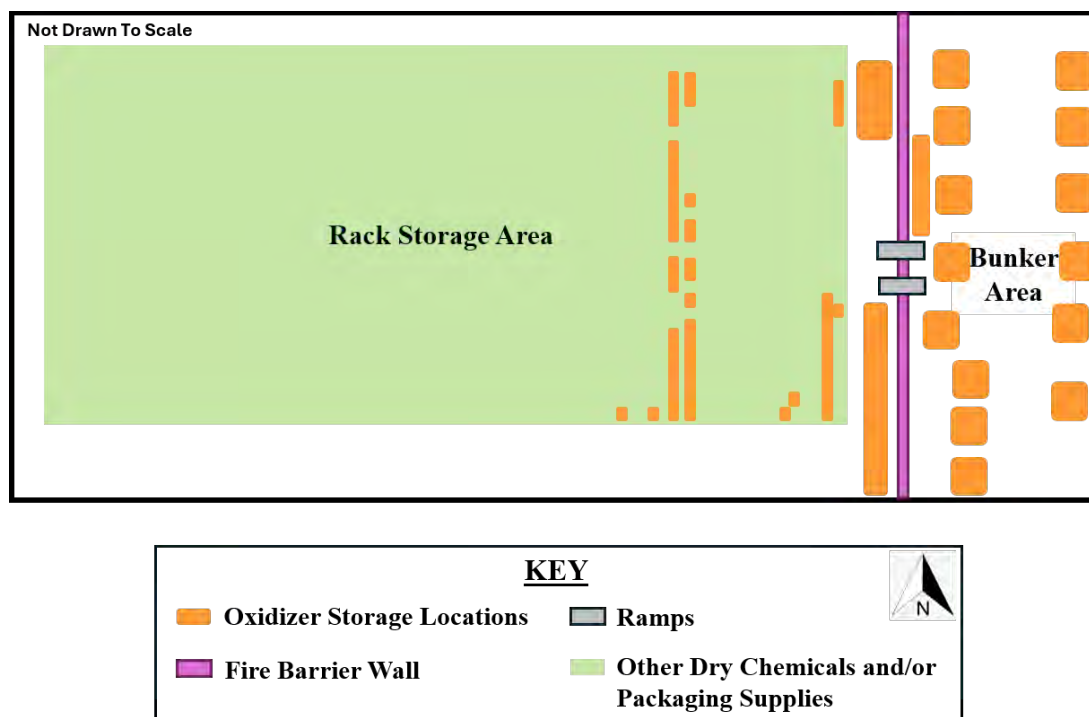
Sketch of the Plant 12 Storage Warehouse floor plan showing the fire barrier wall, rack storage, and the bunker. (Credit: CSB)
